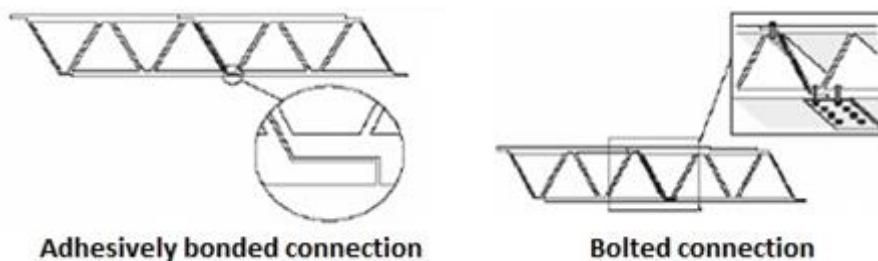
Left: ASSET Fiberline deck with adhesive bond, Right: ASSET Fiberline deck with bolted connection (Liu 2007)
